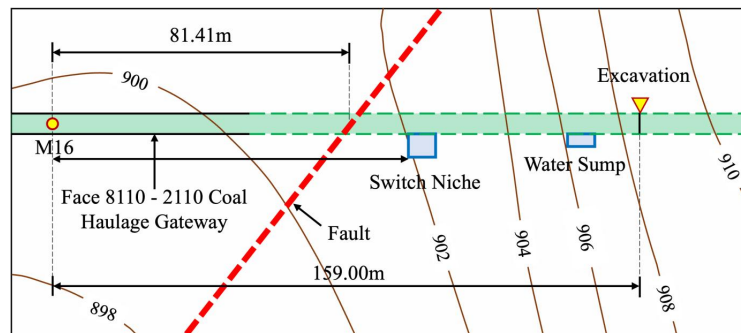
Detection test design and layout of Face 8110-2209 roadway.
